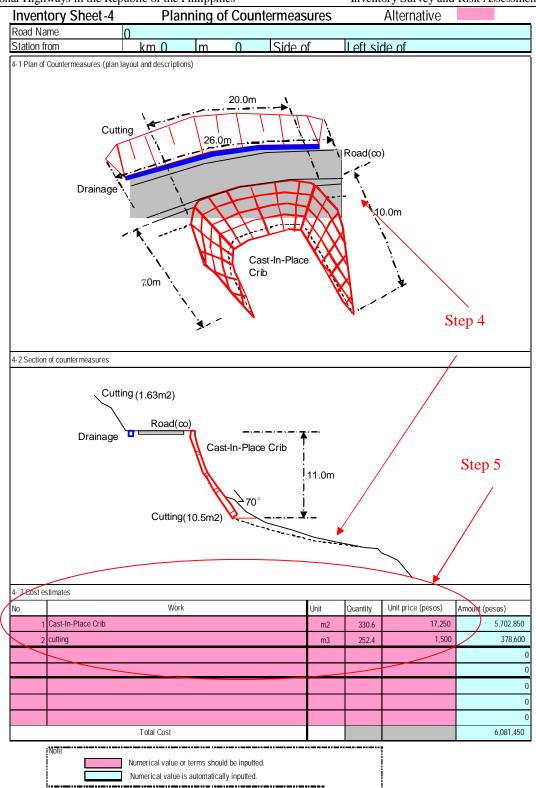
Example of Sheet 4 Countermeasure Plan (Wright-Taft Road: 858 + 250: Alternative-II)
